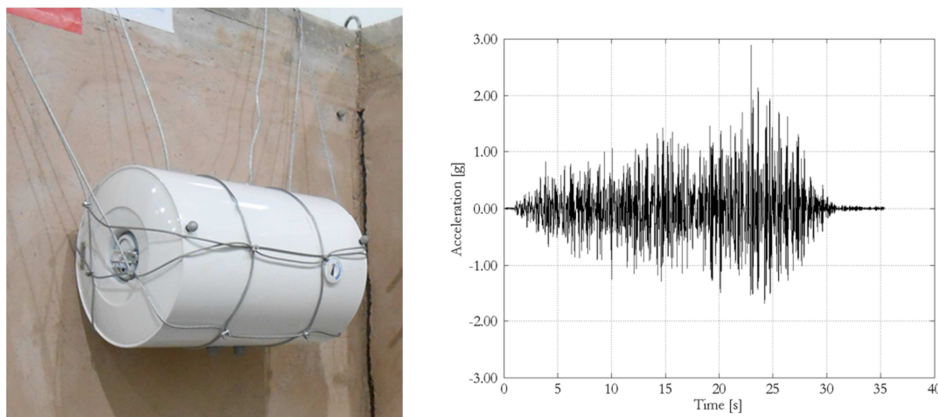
Anchorage of a water heater to masonry infill wall by means of two fixing points with AM and M10 steel stud.
